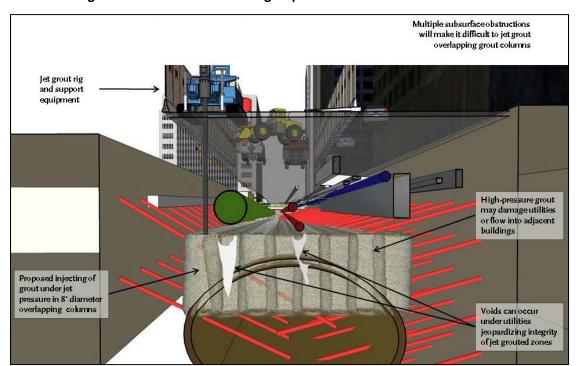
Possible Grouting Impacts Related to SEM Construction
